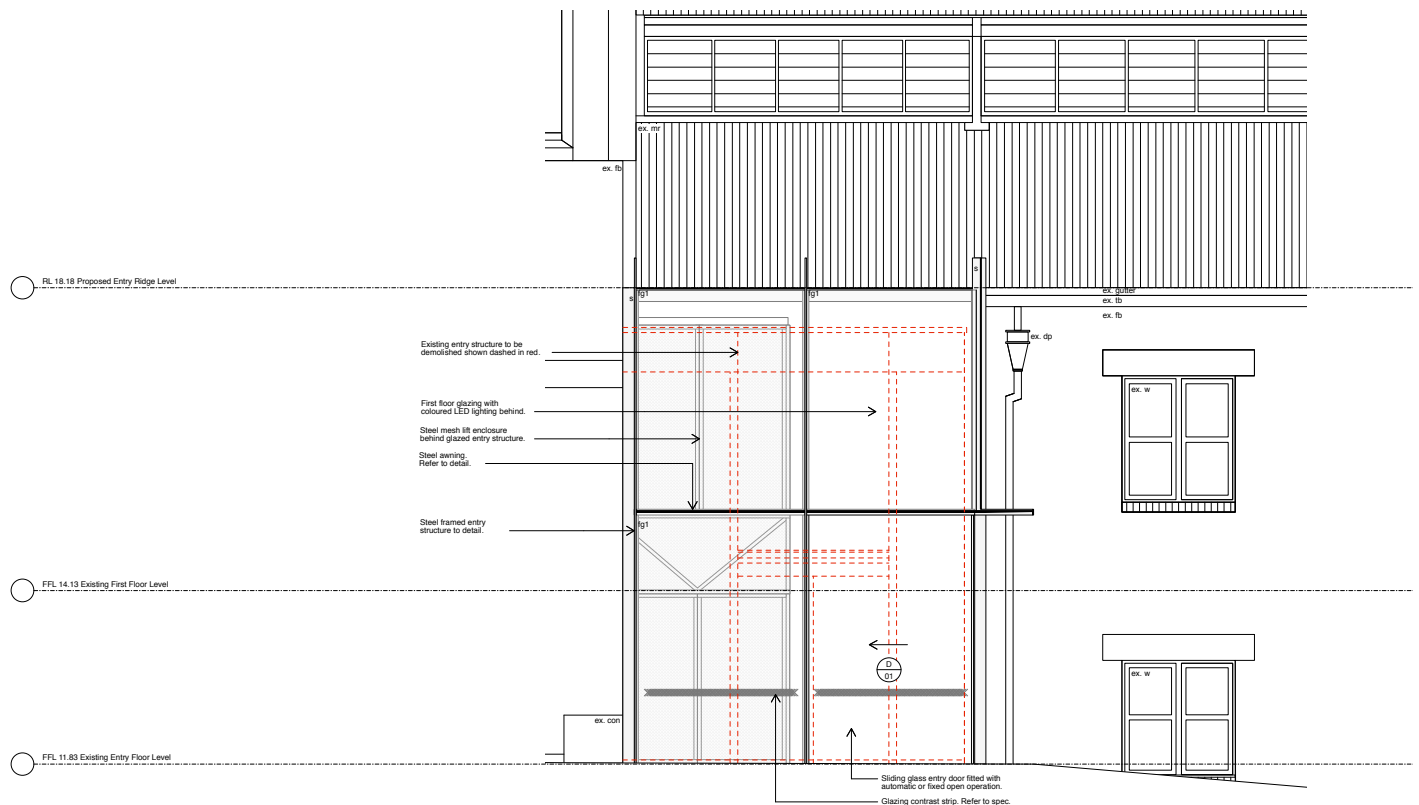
Proposed Playfair Street elevation prepared by Welsh + Major Architects.
